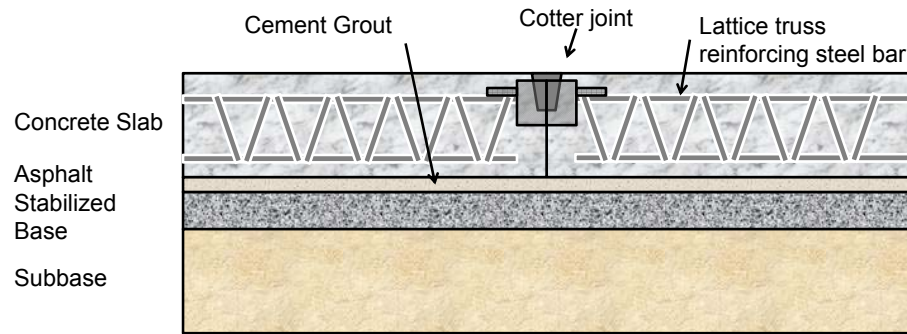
Precast Reinforced Concrete Pavement Cross-Section - Japan
